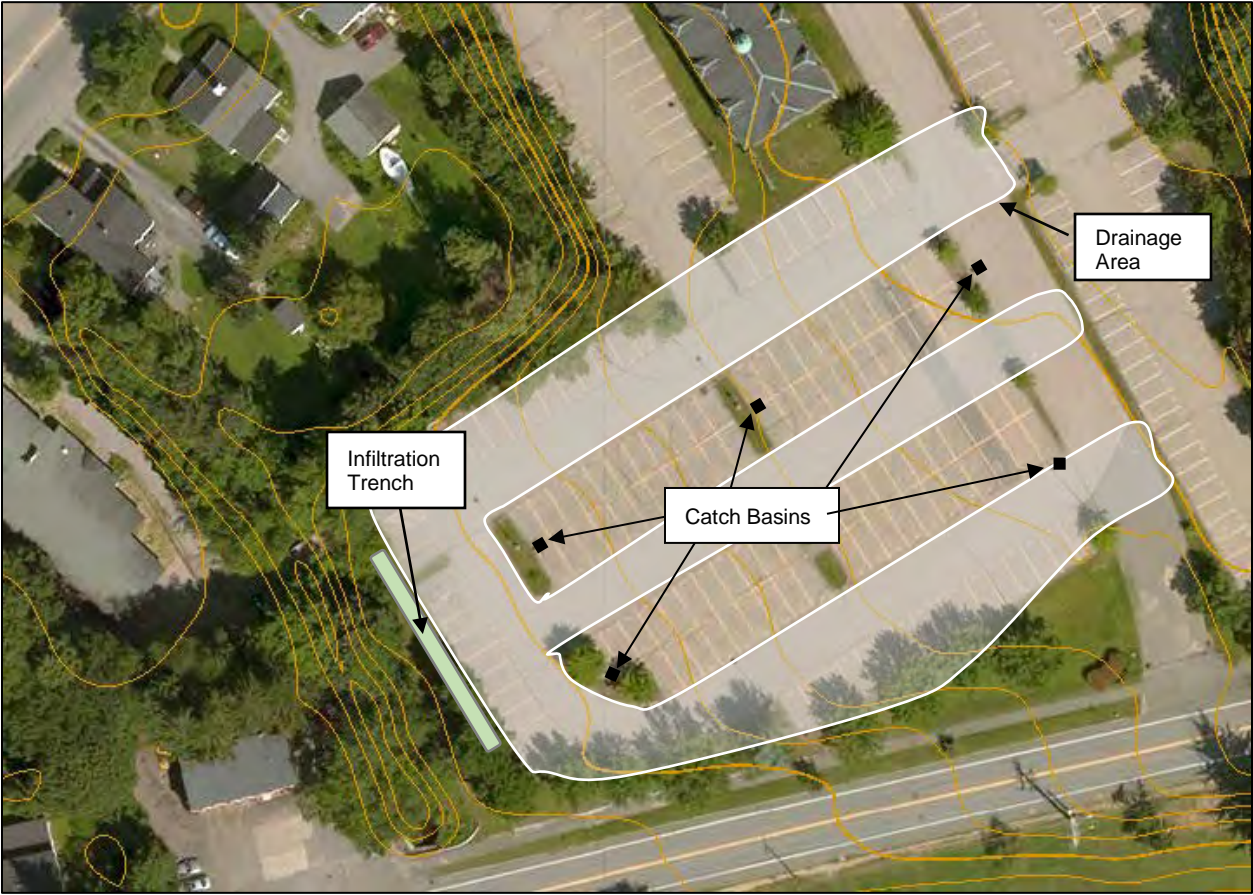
Proposed BMP configuration for Concord High School Parking Lot.
